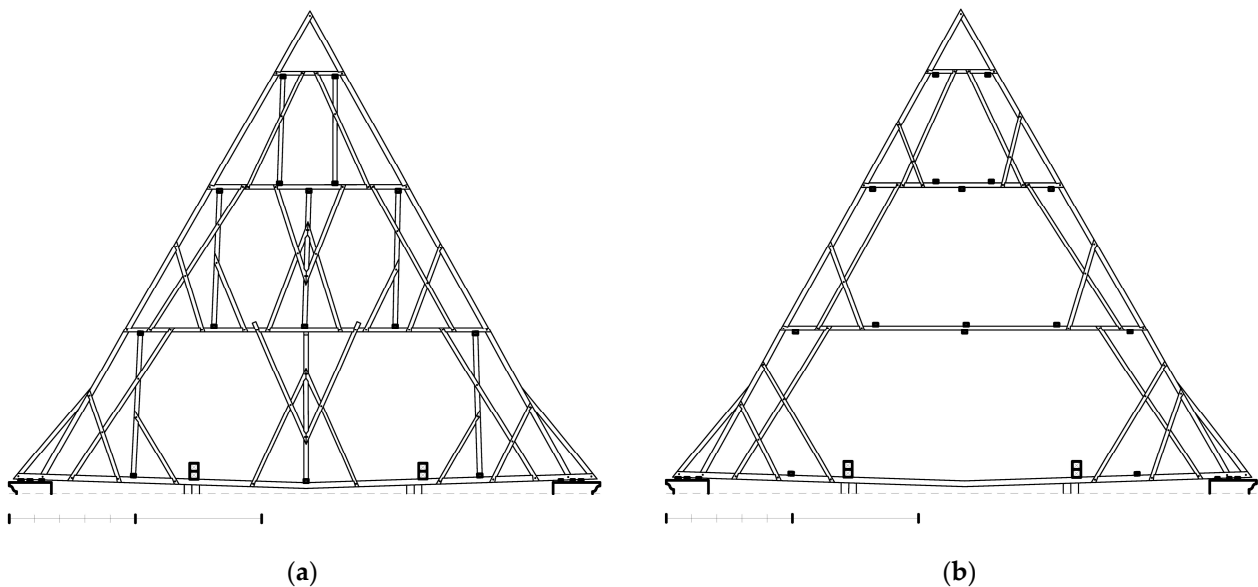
Bistrița church original roof trusses: (a) main truss; (b) secondary truss.
